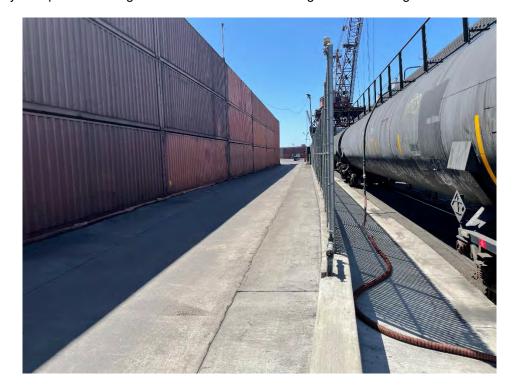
Looking south from SW-4 toward SW-3, adjacent to Lauritzen Channel. Concrete seams appear in good condition.
